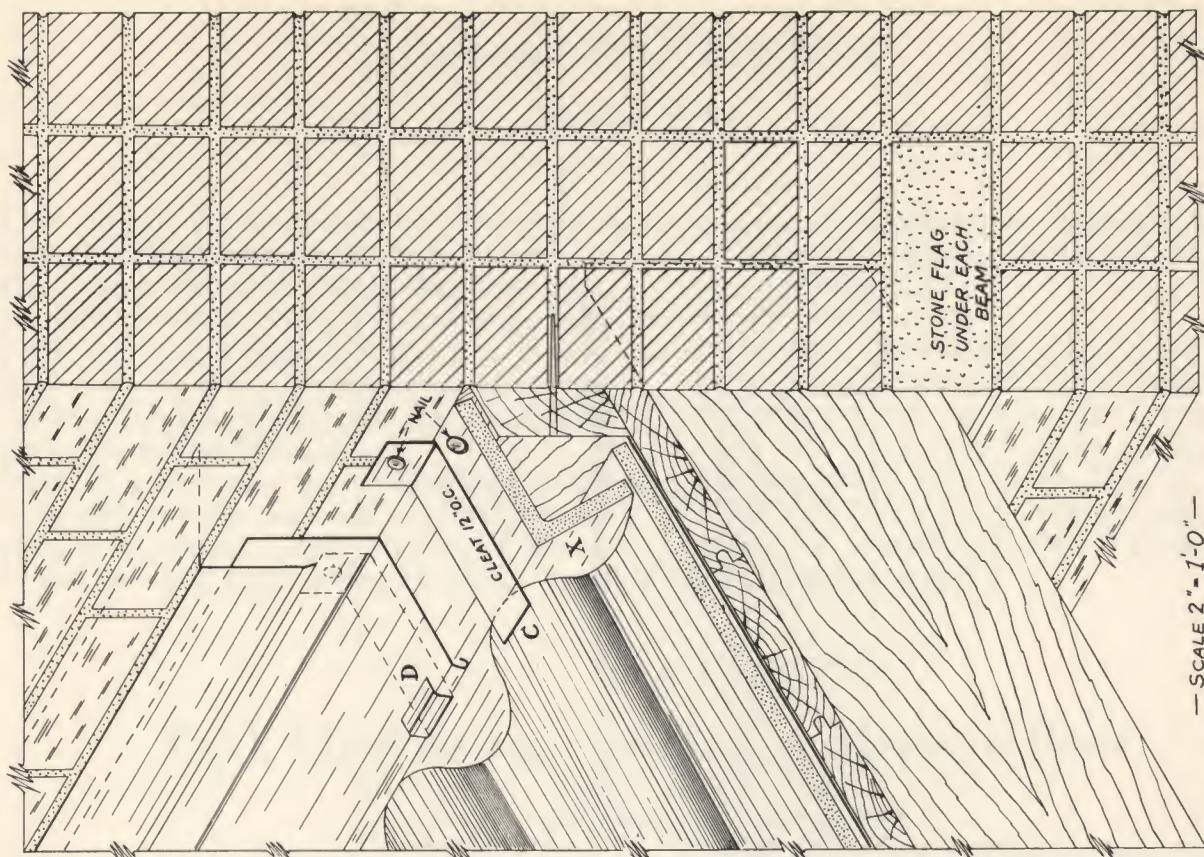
METHOD OF APPLYING CAP AND BASE FLASHINGS AT WALL ABUTMENT
